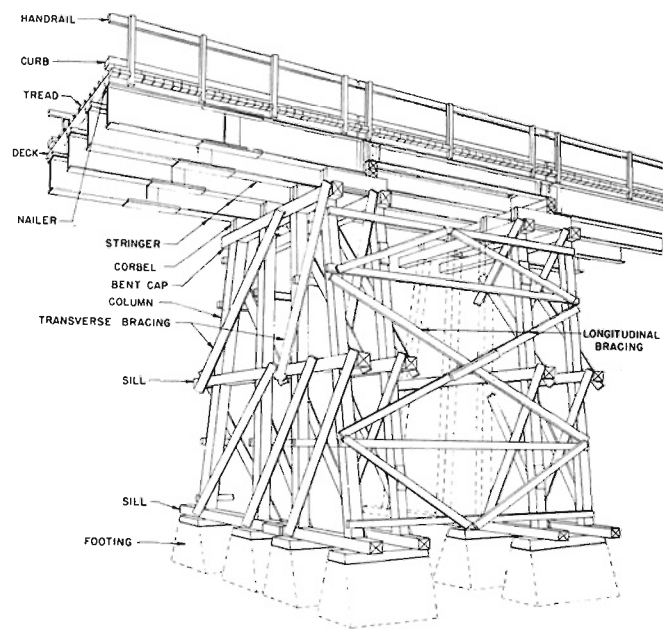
Highway bridge, class 50, single-lane, steel stringer spans, framed timber tower on concrete pedestals.
